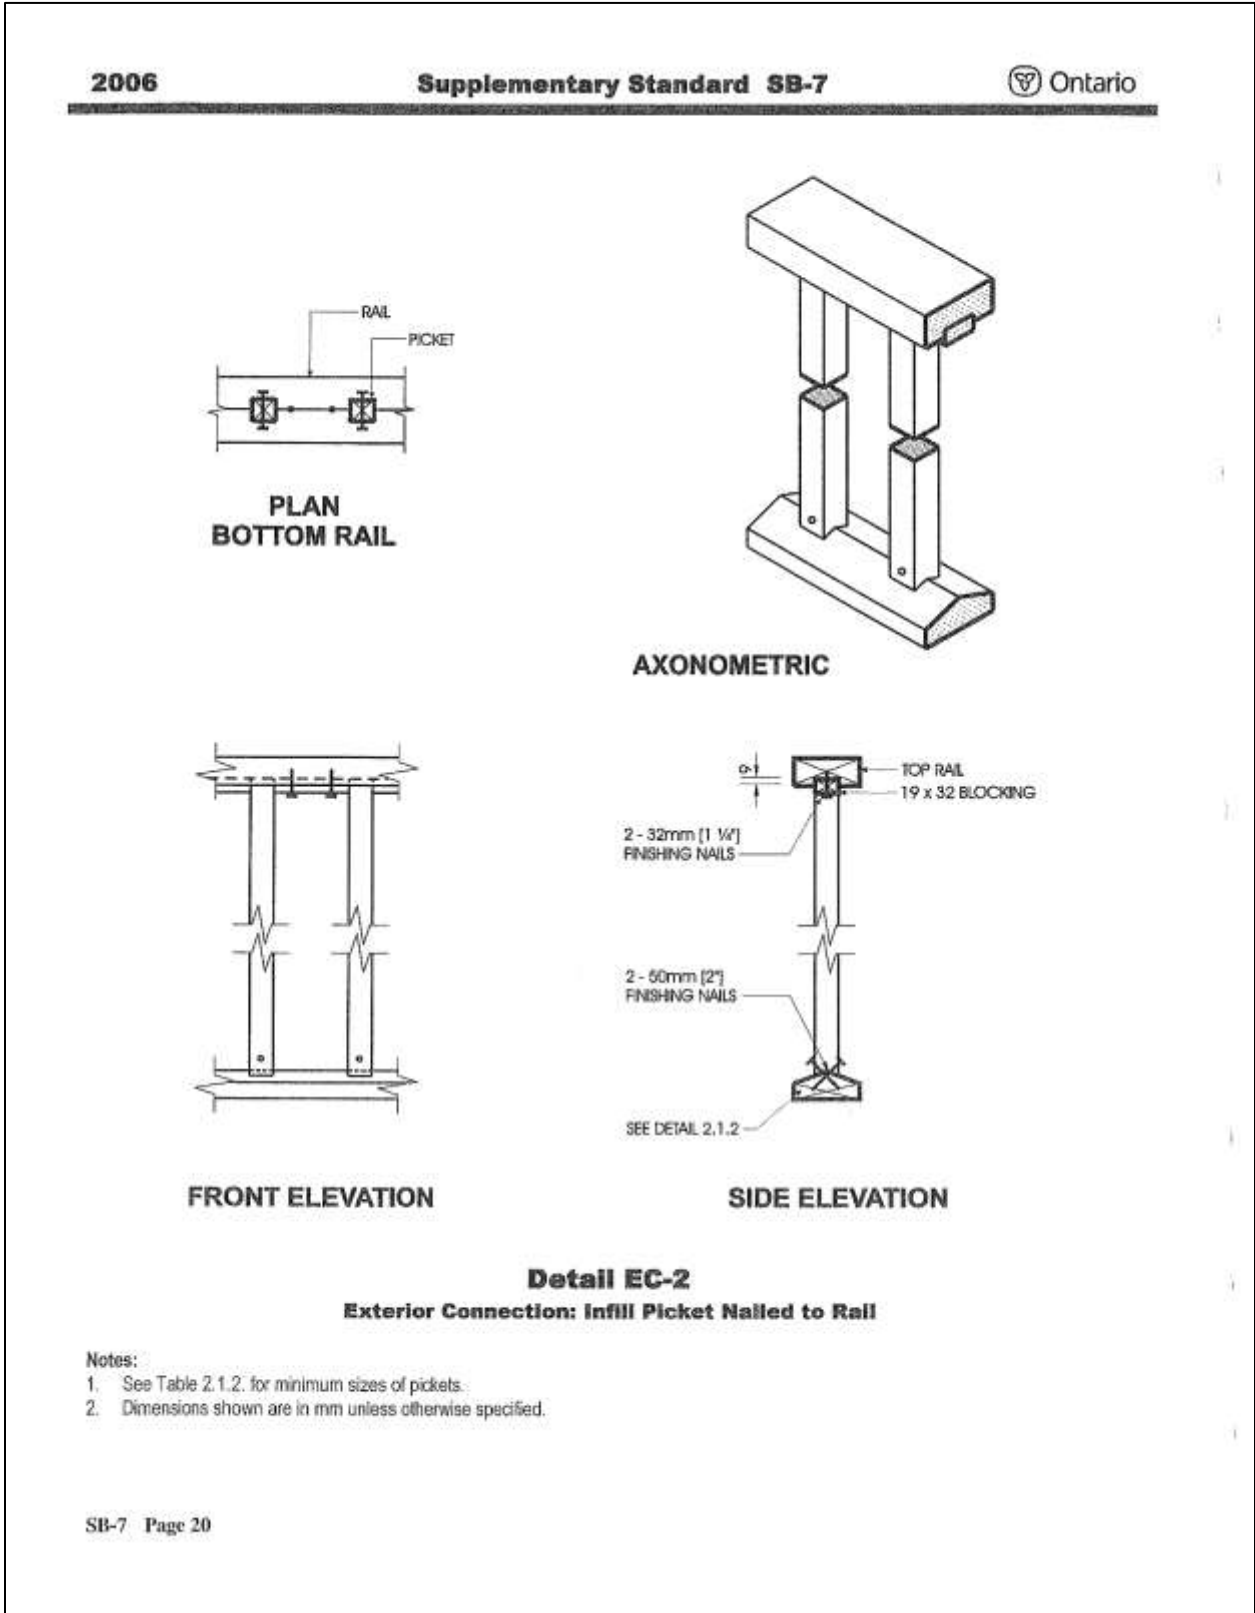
Detail EC-2 of the Supplementary Standard SB-7 to the Ontario Building Code, shows the details of a "traditional" railing with a top and bottom rails and square spindles set between.
